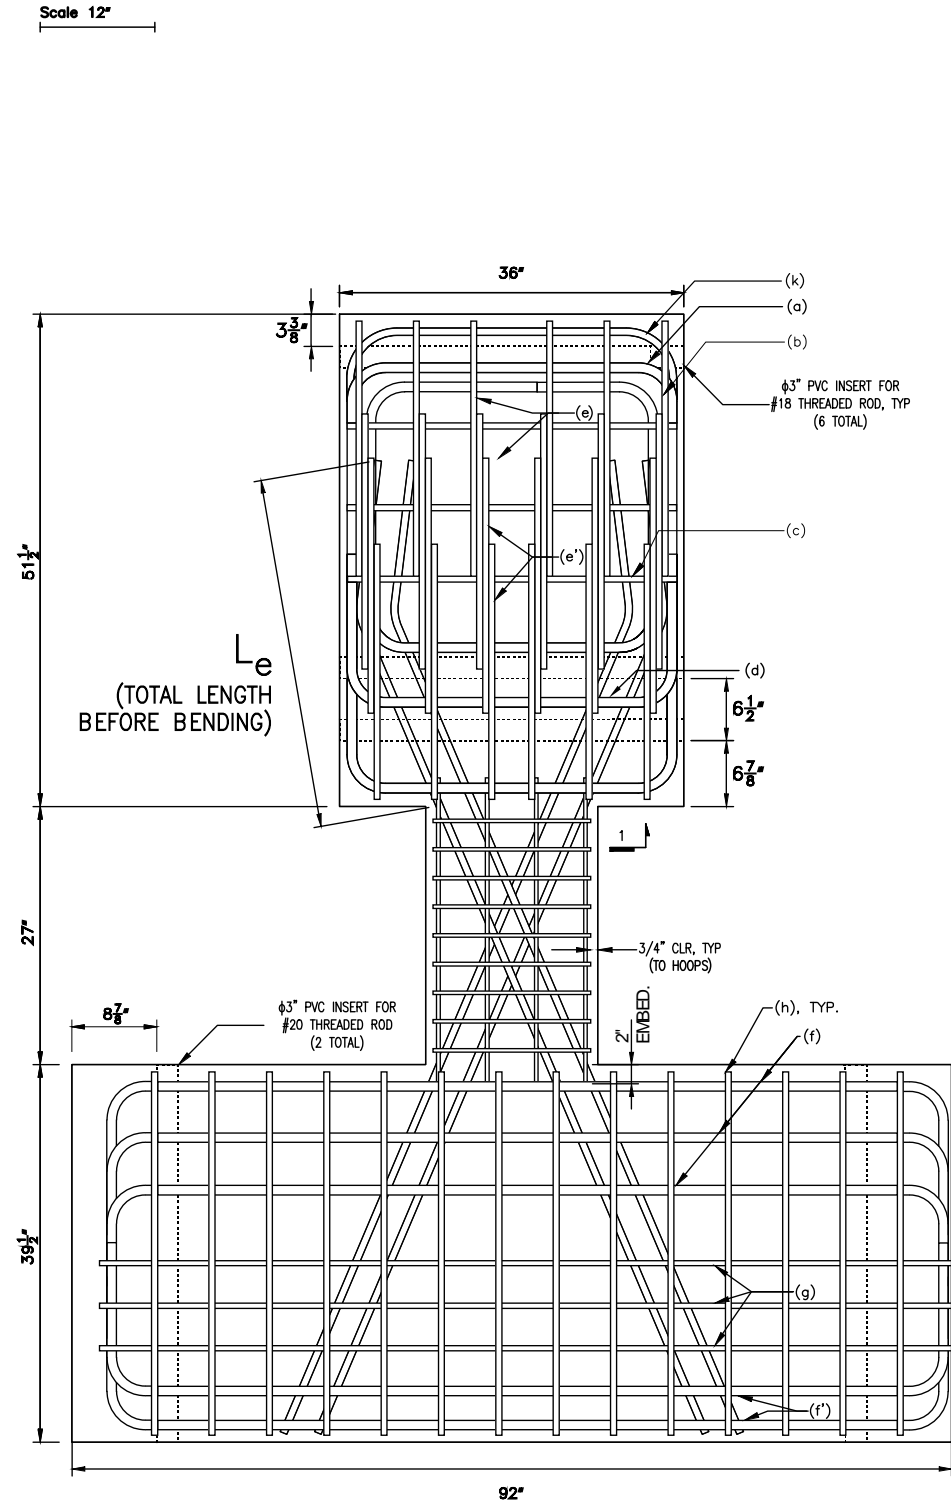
Elevation view of D120-1.5 (1 in. = 25.4 mm)
